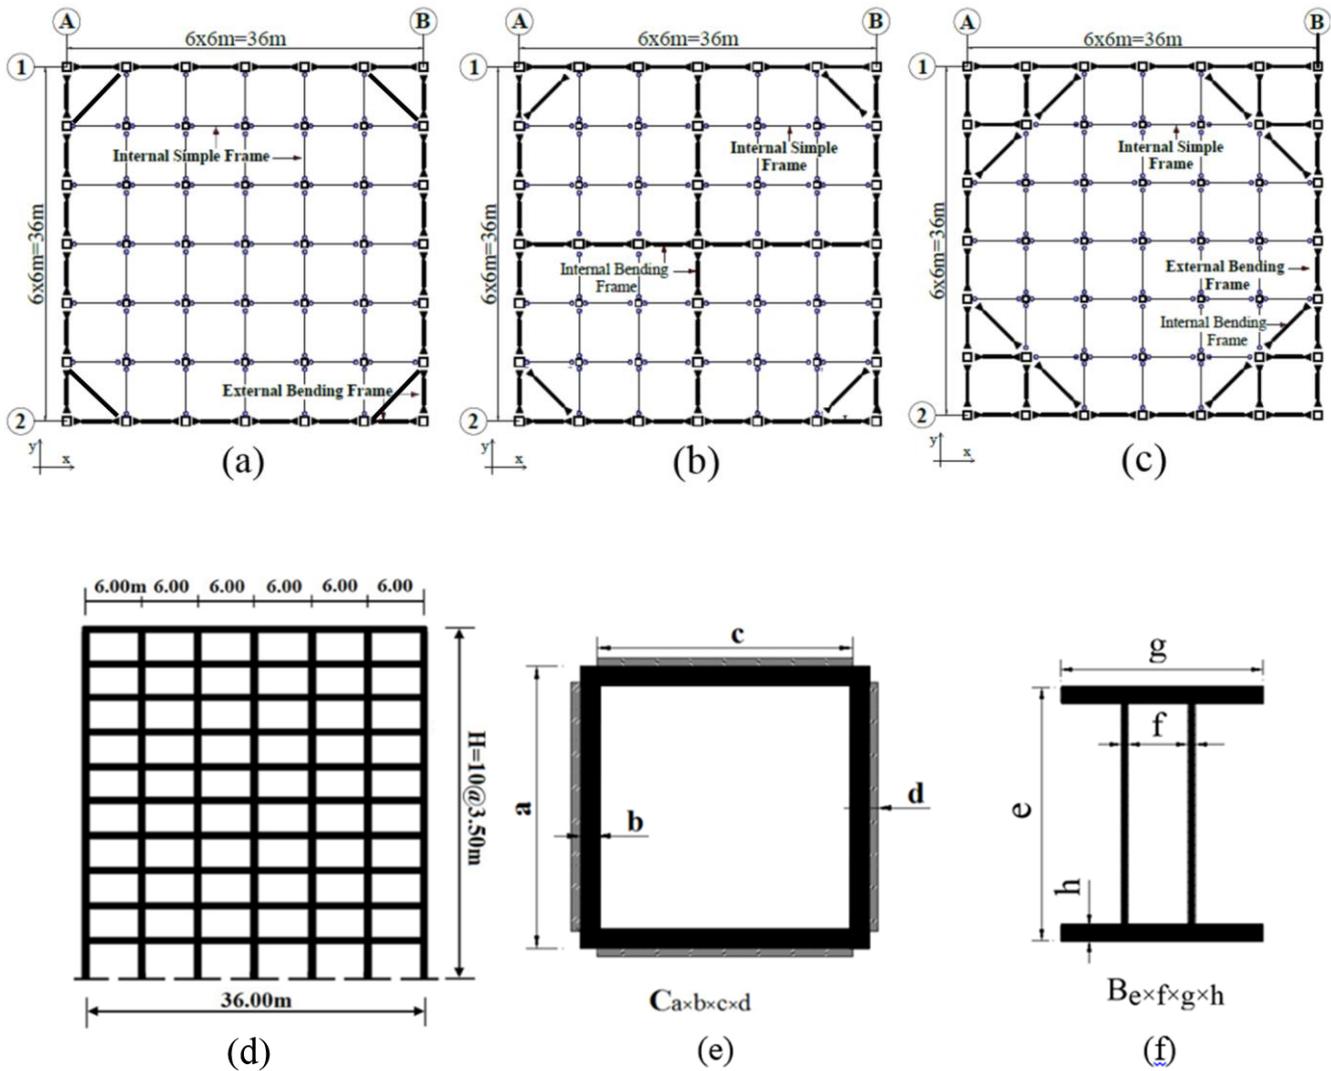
The studied structural models: (a) Plan of Framed tube (F.T.); (b) Plan of Bundled tube (B.T.); (c) Plan of Castled tube (Ca.T.); (d) The 10-story configuration (e) Columns section properties of 10-story models; (f) Beams section properties of 10-story model
